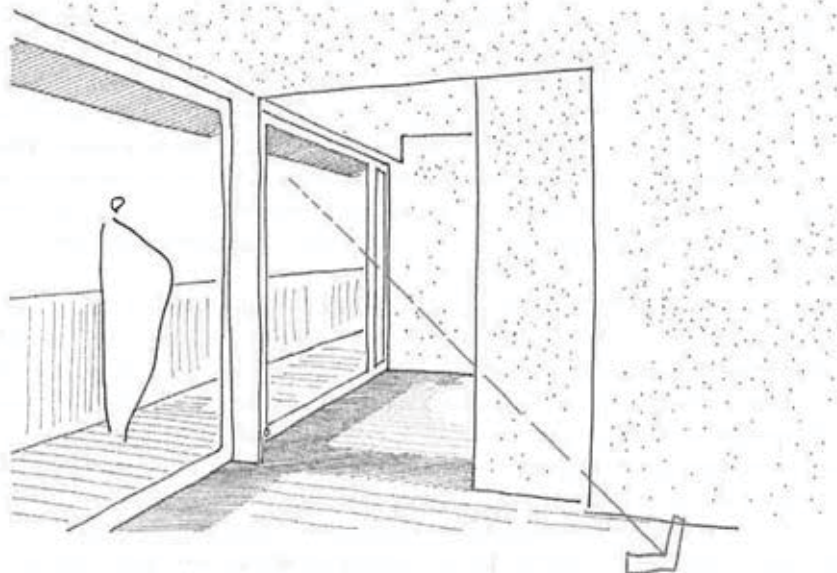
Low Energy Apartment Building, Berlin, apartment.
